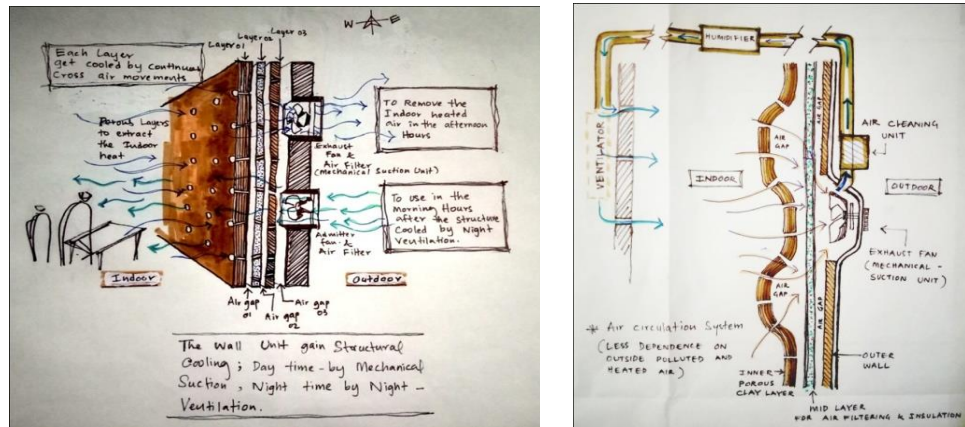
The conceptual idea developed for cross air movement of the proposed clay wall.
